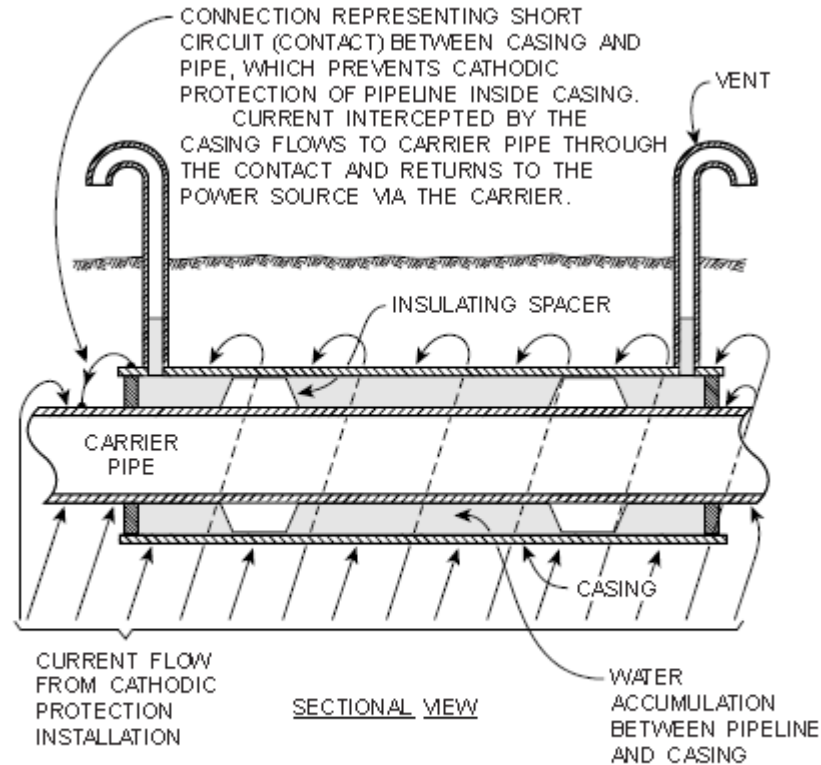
Electrical shielding by a shorted pipeline casing.
